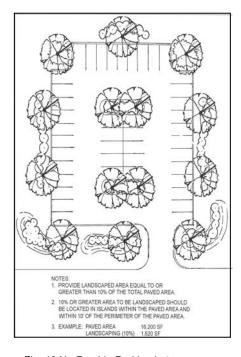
X - Provide Parking Lot Planting to Reduce Heat Gain
